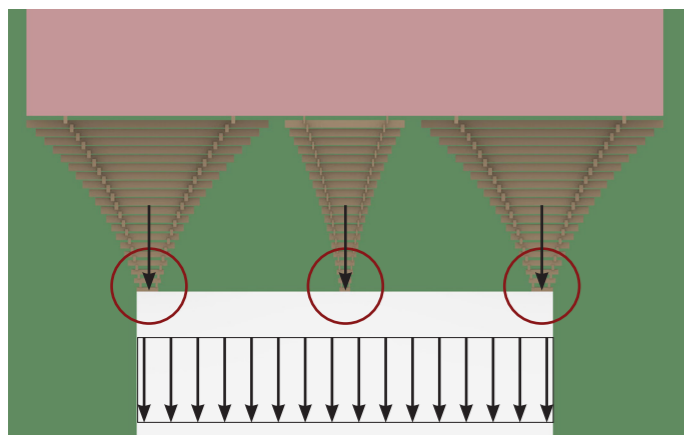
Side view of the discrete timber columns on the existing structure (own work, 2024)
